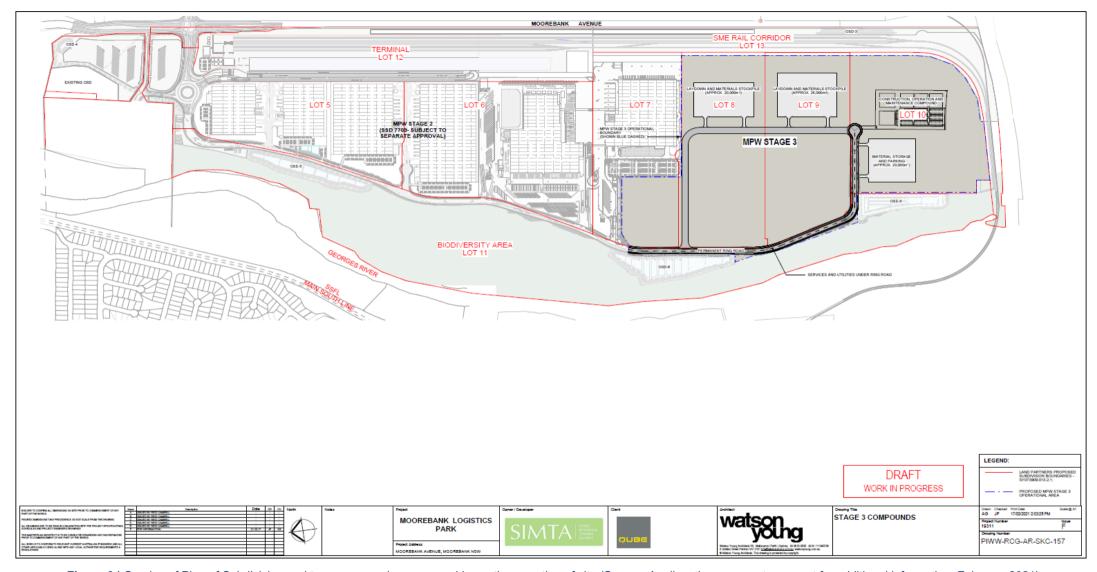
| Overlay of Plan of Subdivision and temporary works compound in southern portion of site (Source: Applicant's response to request for additional information, February 2021)
